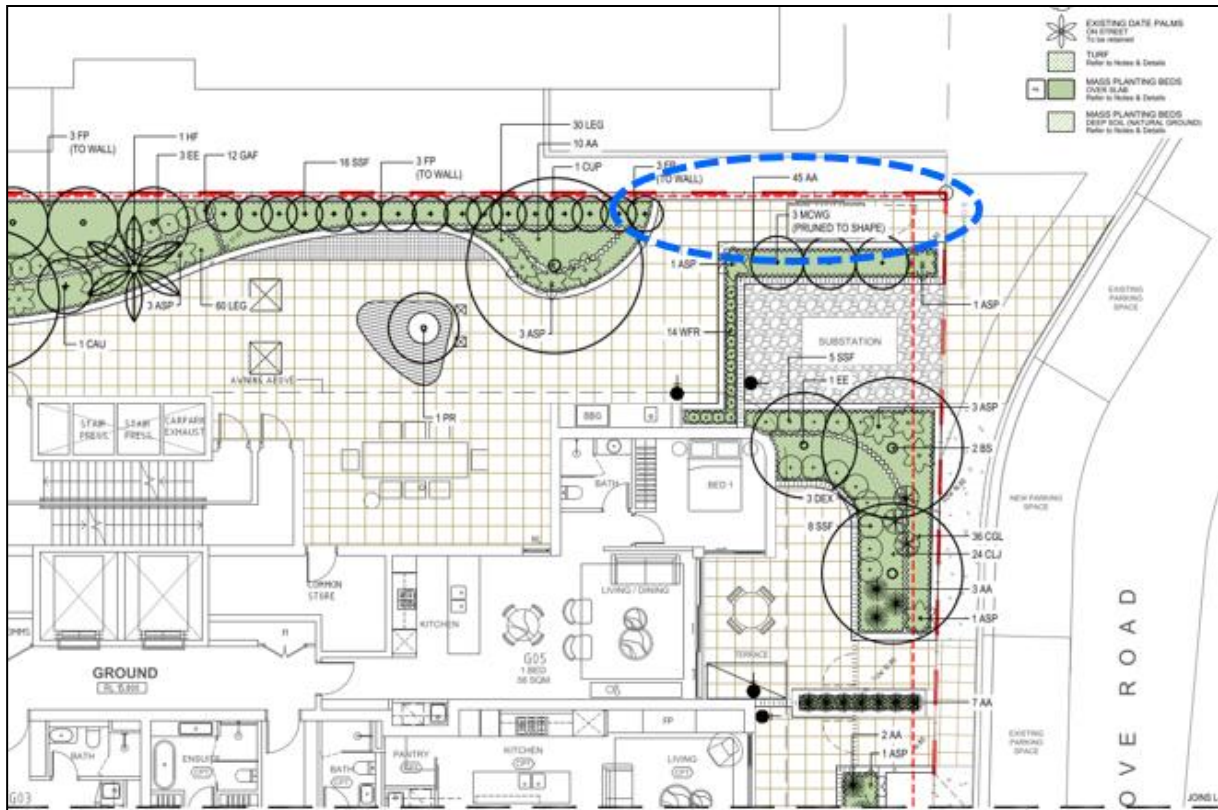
proposed landscape treatment along the stairs (source: Applicant's revision 1 plans)
